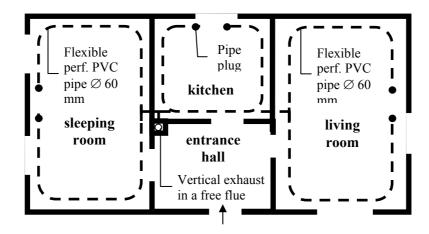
Flexible perforated pipes inserted into the drainage layer during the reconstruction of floors. Pipes are laid along walls in order to stop radon from entering the dwelling through the wall-floor joint or through vertical holes and pores within the wall. This layout of pipes decreases at the same time the humidity of the soil along walls and thus protects walls from becoming wet (if the damp-proof insulation is not placed under walls)
